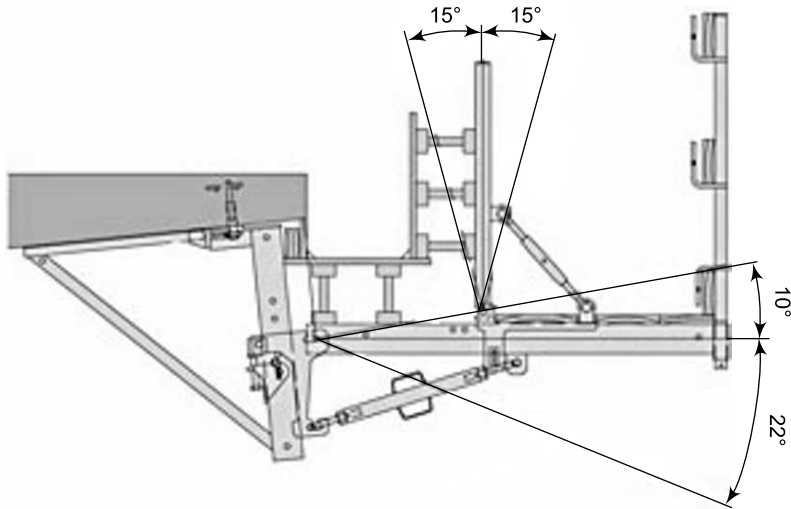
Schematic Sketch of Bridge Edge Beam Formwork T.
